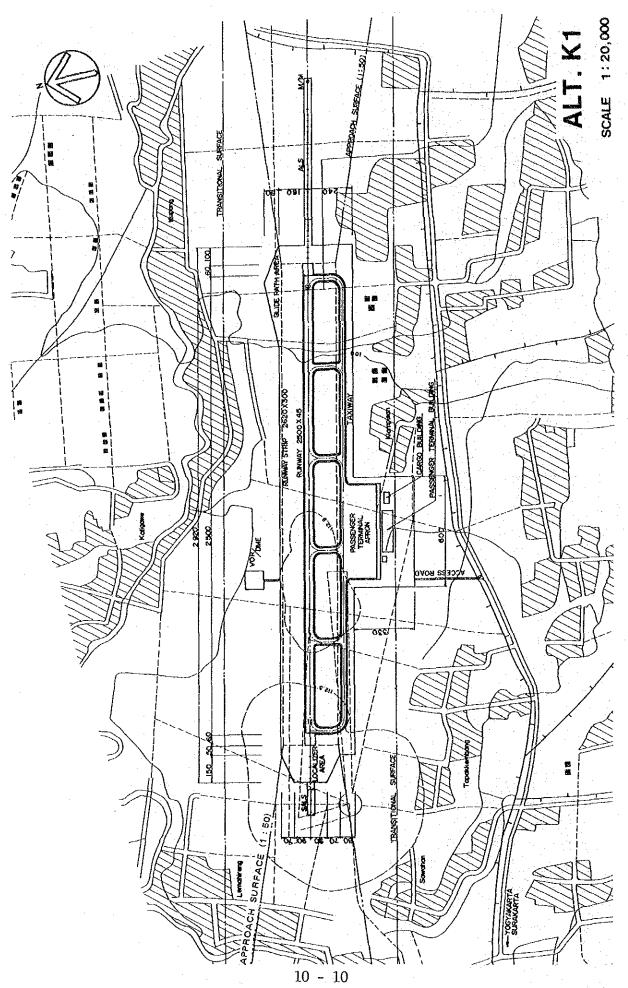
Layout Plan of New Airport - Klaten
